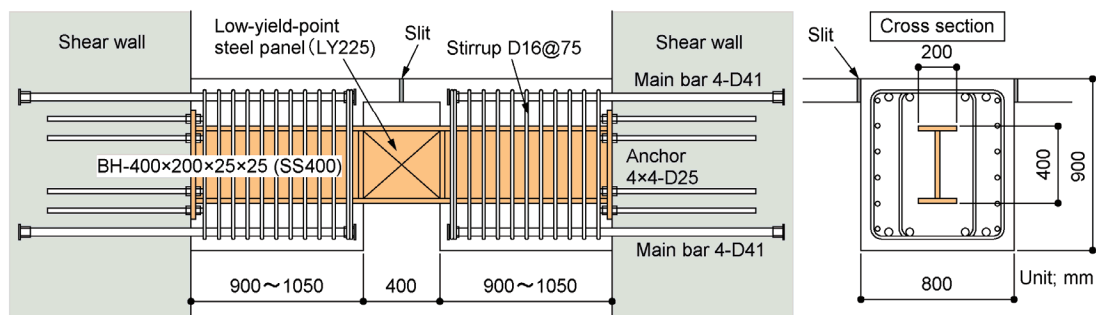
Low-yield-point steel damper (coupling-beam damper)
